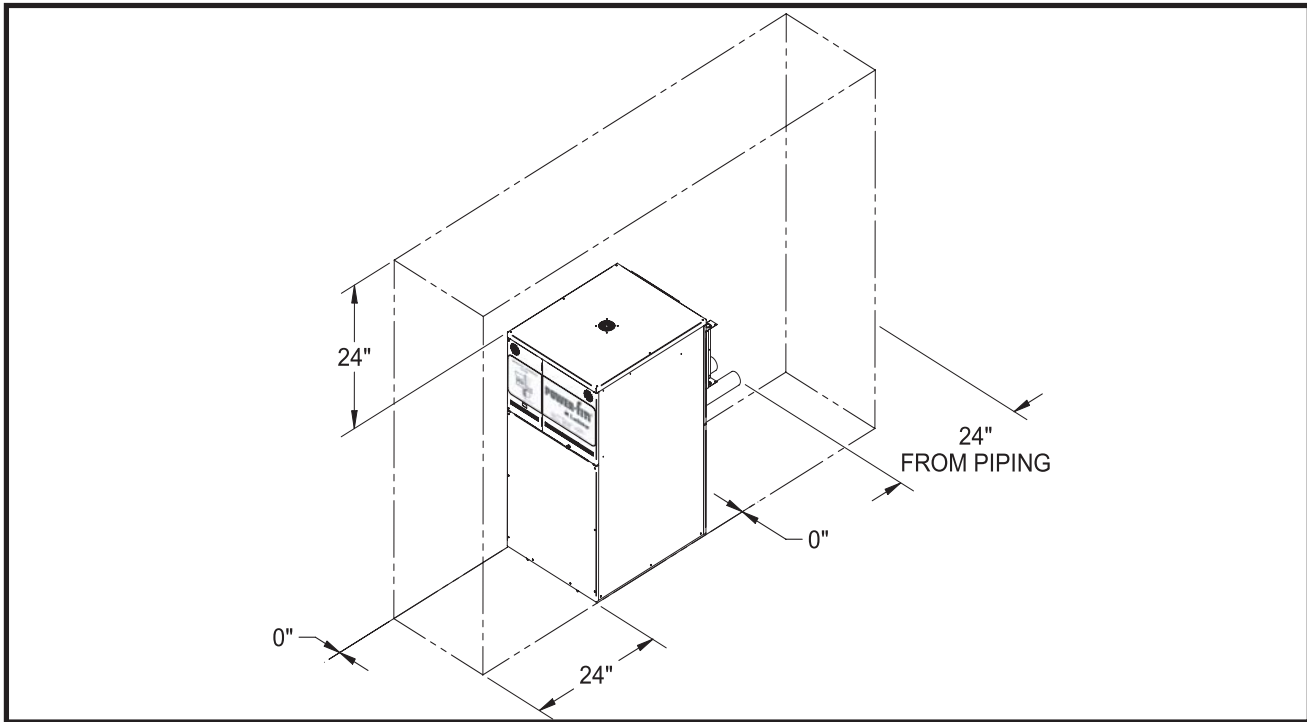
Clearances from Combustible Construction - Front & Rear View
